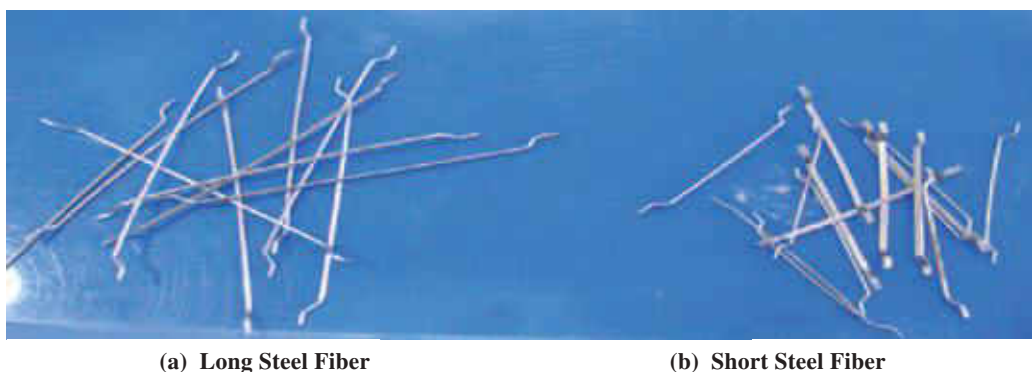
Hooked-end steel fibre for Hybrid Steel Fibre Reinforced Concrete (HSFRC) panel.
